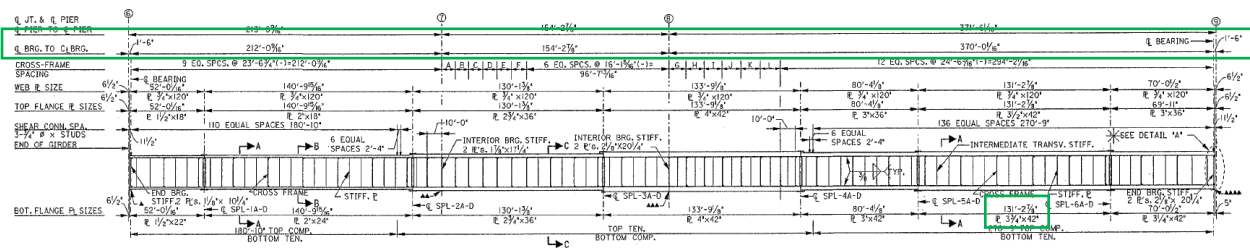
Elevation view showing the girder span length  $L$  between bearing lines.
